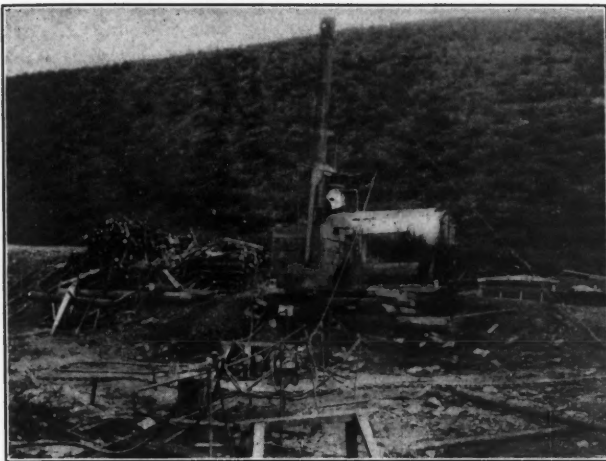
STEAM THAWING FOR STEAM SHOVELING.
